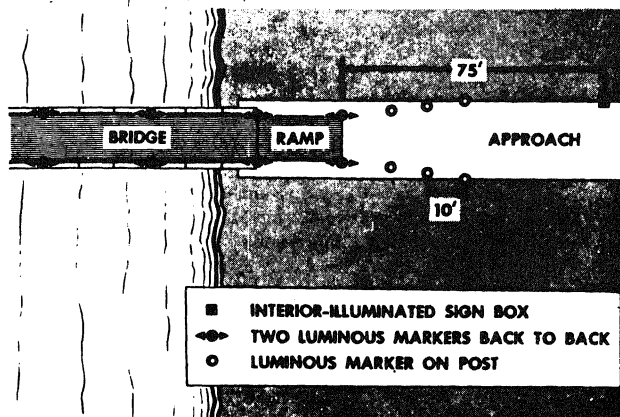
Arrangement of luminous markers on approach and on bridge.
